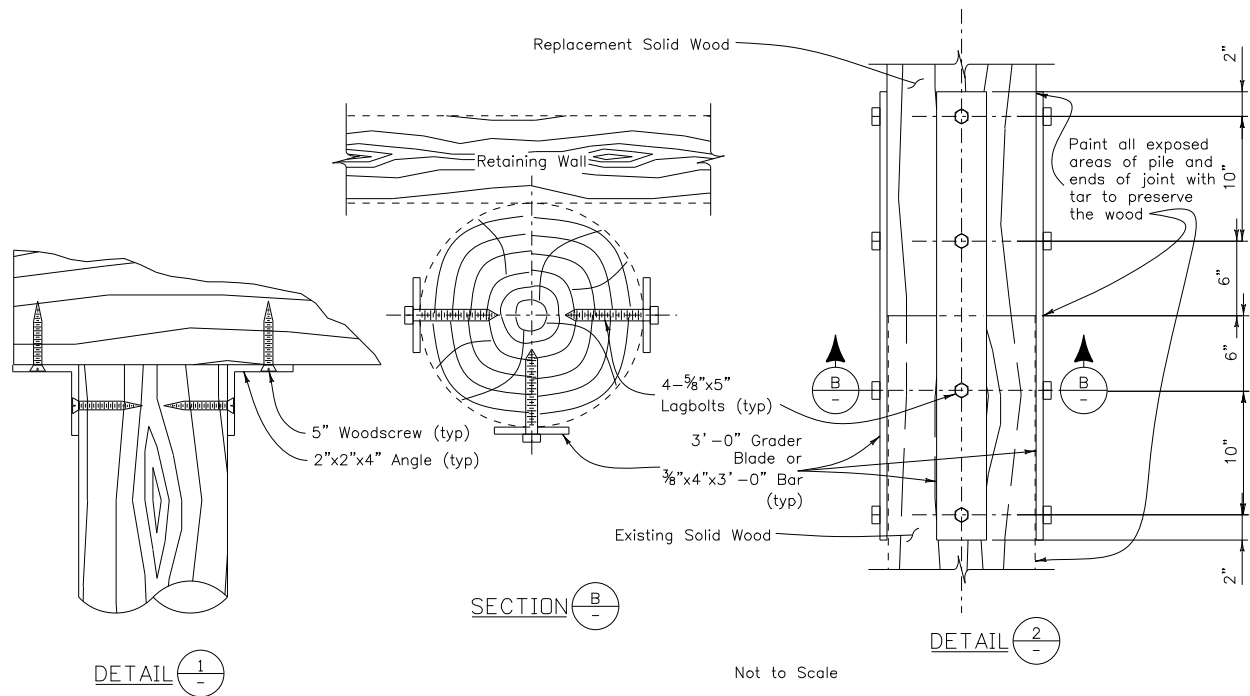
(G)-8 Sample Details of Replacing Portion of Timber Pile
